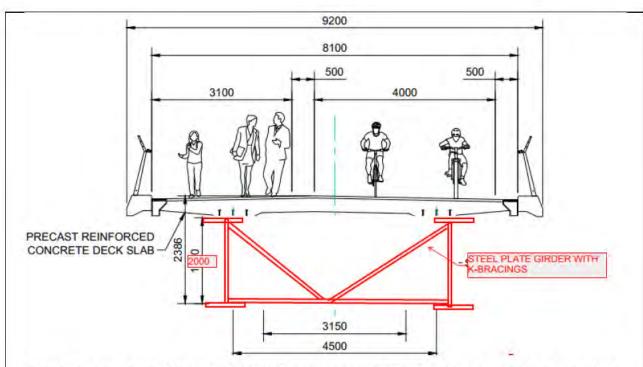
Steel Plate Girder (with K-bracings & concrete deck) - alternate option to box girder
